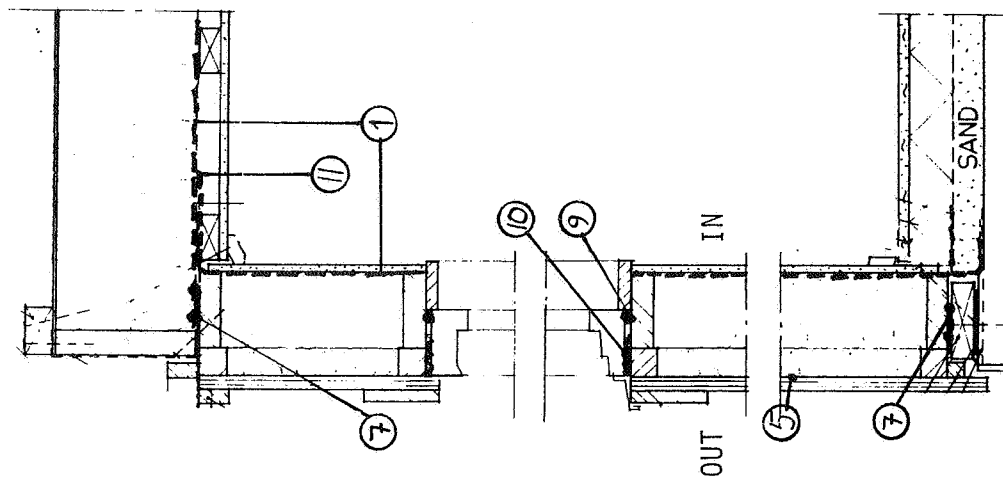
Wind barrier of paper, overlapping and taped vapour barrier. Wall section
